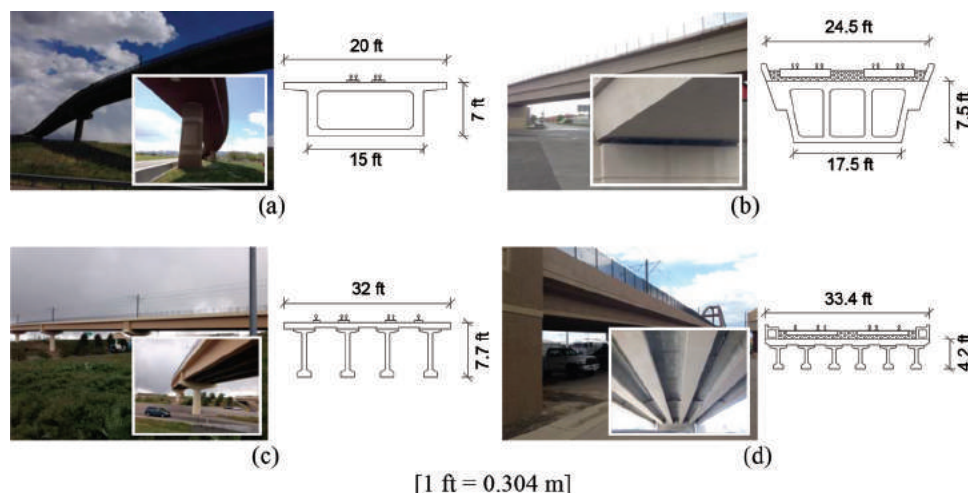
Prestressed concrete bridges carrying light rail transit: (a) Indiana Bridge; (b) Santa Fe Bridge; (c) County Line Bridge; and (d) 6th Avenue Bridge.
